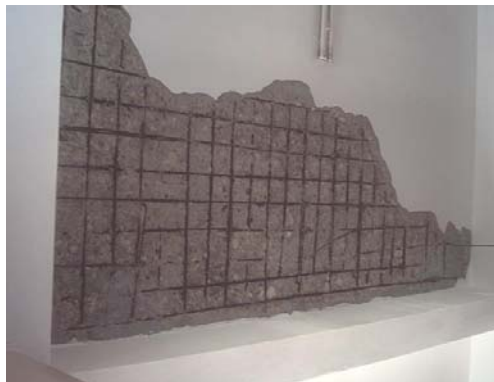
Complete Spalling of Concrete Cover.
